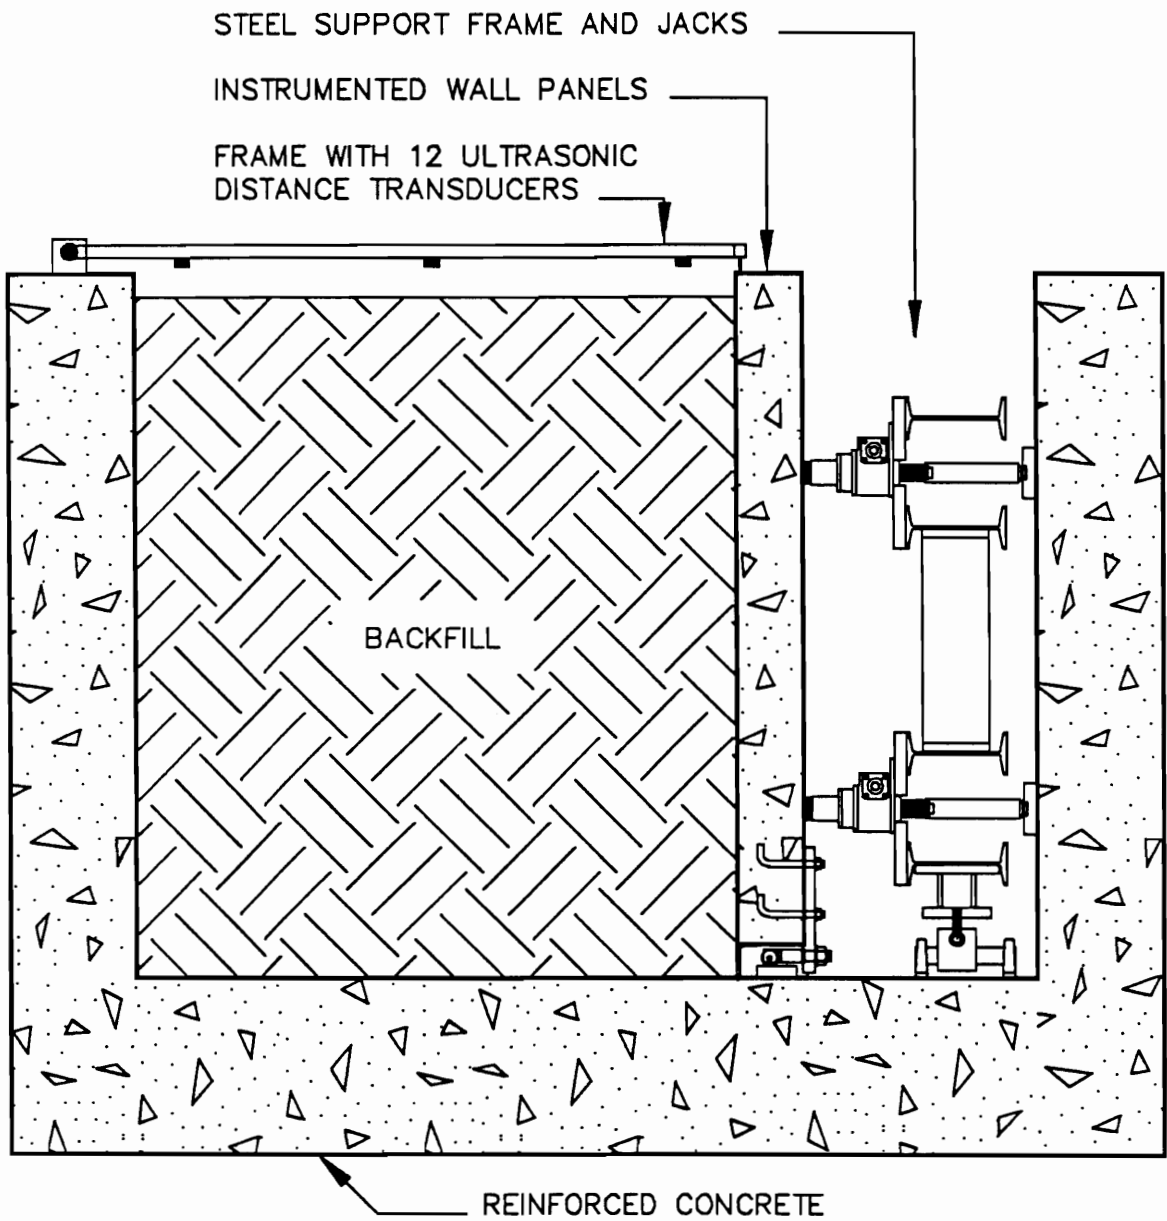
Instrumented Retaining Wall and Concrete Frame.
